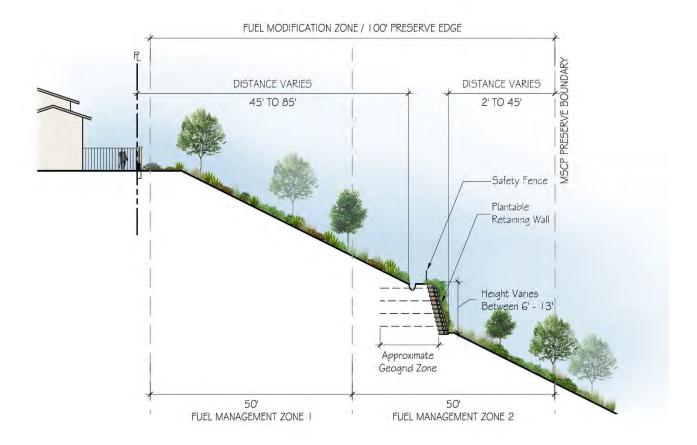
Slopes & Plantable Retaining Walls at Preserve Edge
